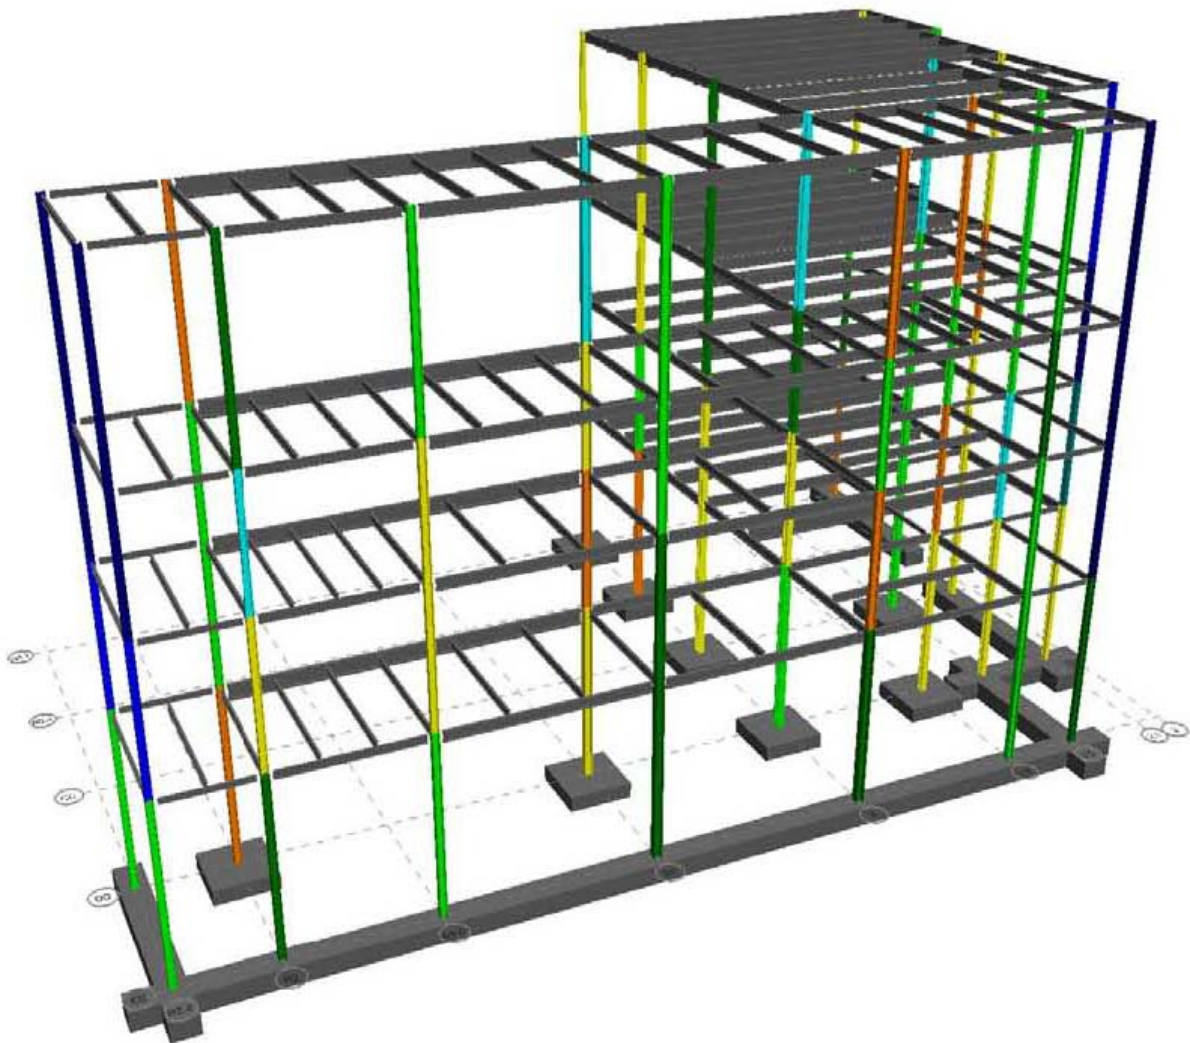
RAM Concept Model of proposed structural redesign with column loads
